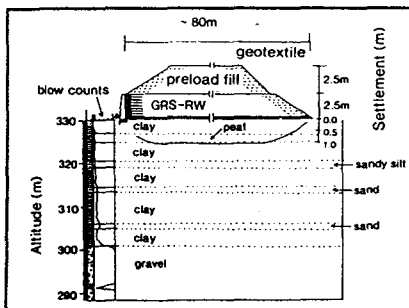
Typical cross-section of GRS-RWs having a nearly saturated clay backfill for the Shinkansen yard north of Nagano City (a full height rigid facing was constructed after preload was removed).
